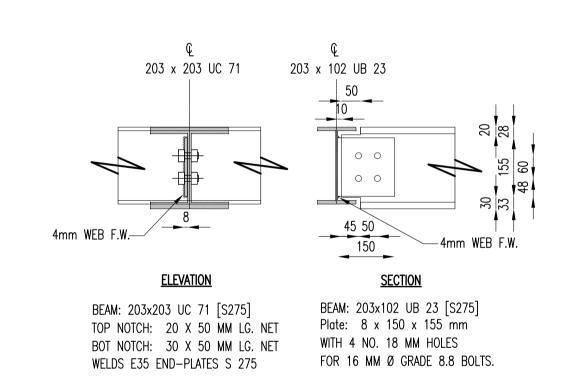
BEAMS TO BEAM CONNECTION SCALE 1:10
